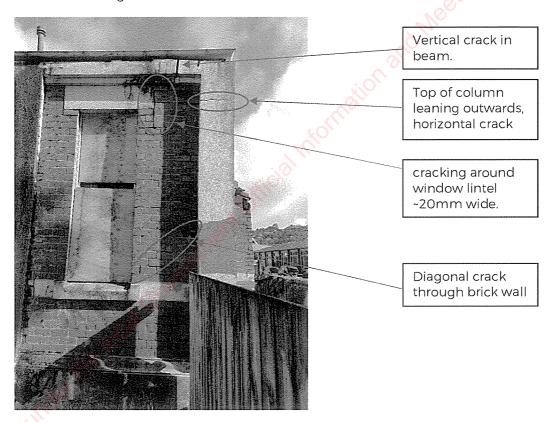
North-East corner of Old Court House showing damage to brick walls
